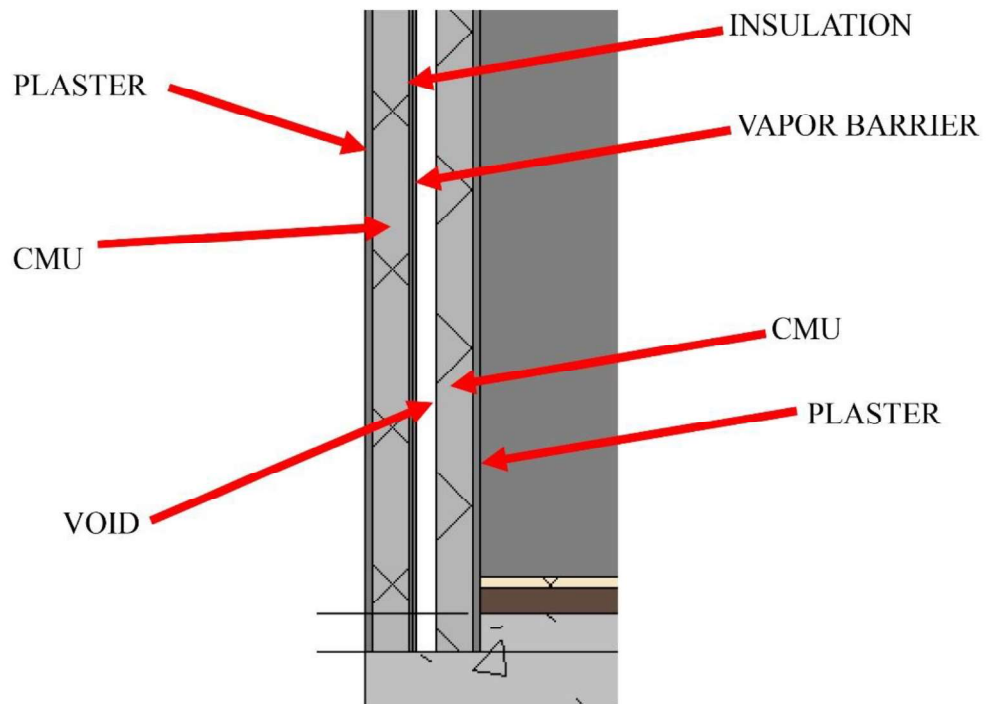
Wall section showing construction materials. Source: Revit Autodesk 2020 by Author
